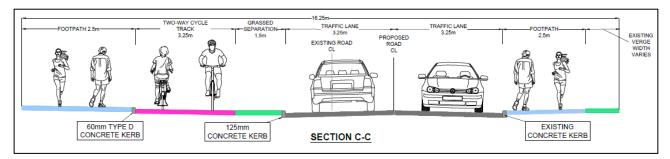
Typical cross-section of Kilmacrennan Road proposals (facing northbound)
